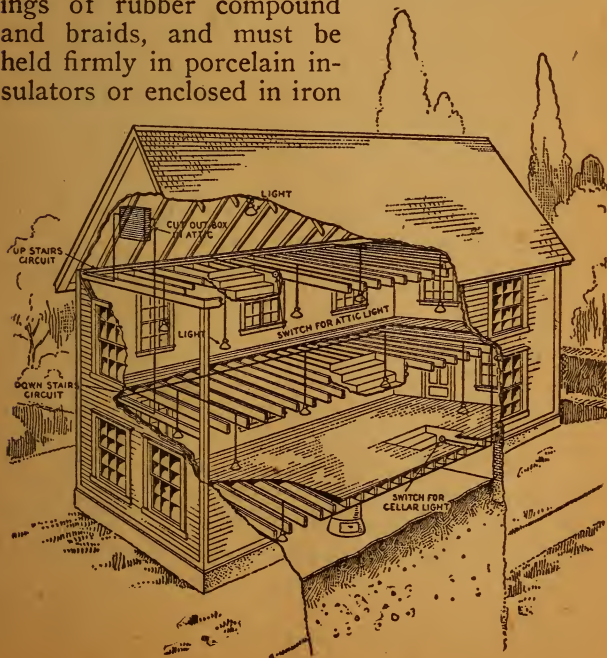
Sectional view of a dwelling, showing light wiring and lamps.
